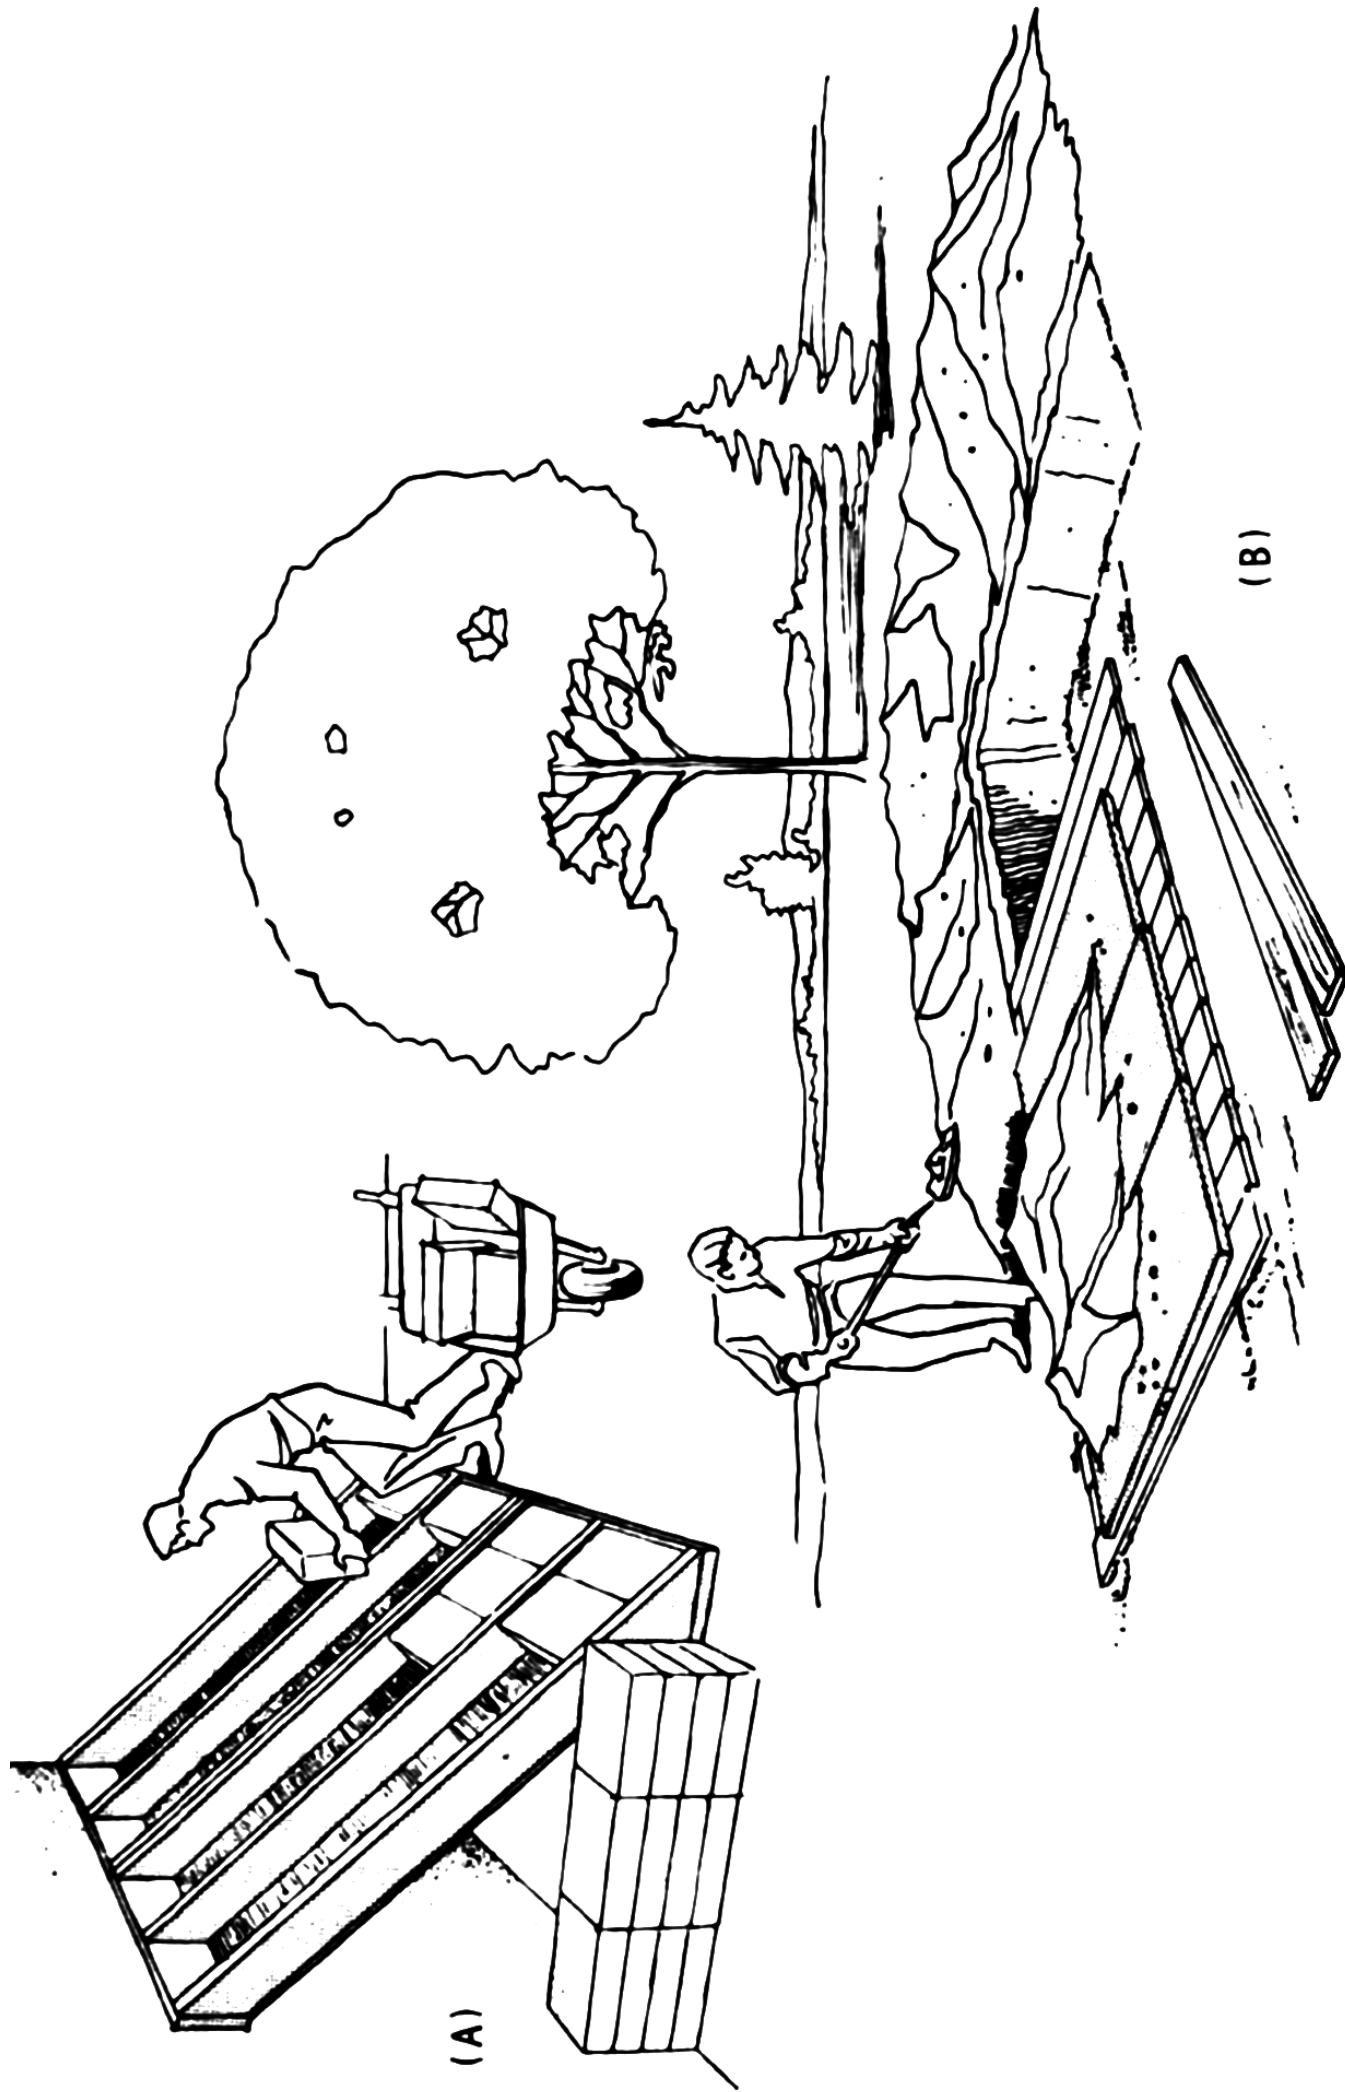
Improvising fallout protection outside: (a) Lean-to shelter; (b) “L” shaped trench.
